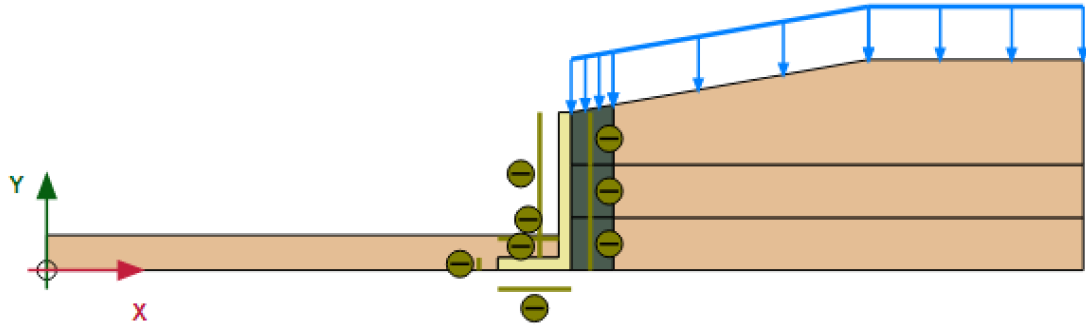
Retaining wall with backfill slope 10° and 1.2m TDA backfill
